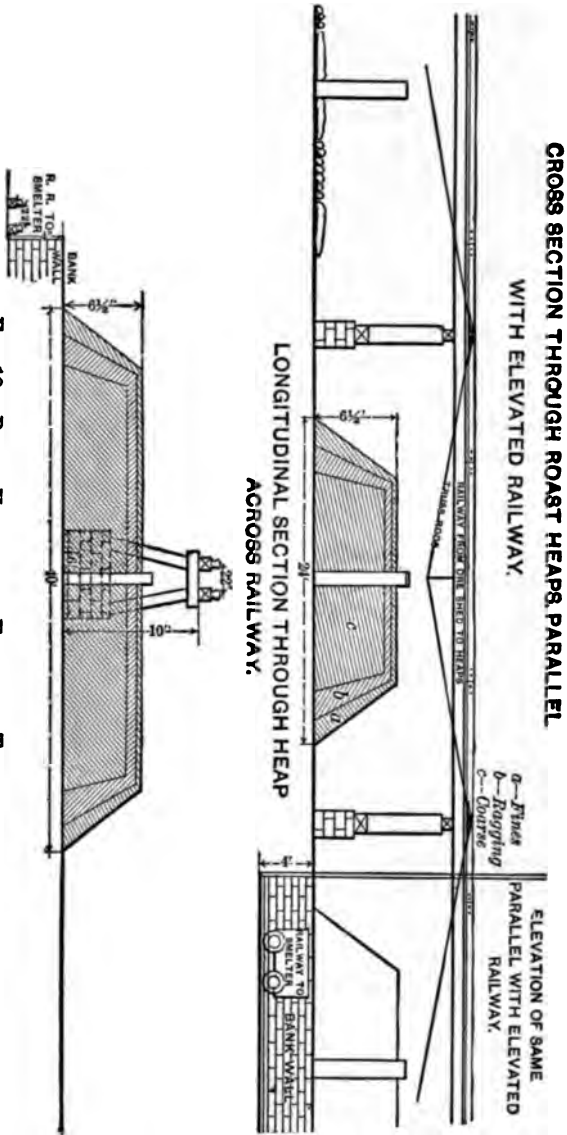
ROAST YARD WITH ELEVATED THRESTLE.
